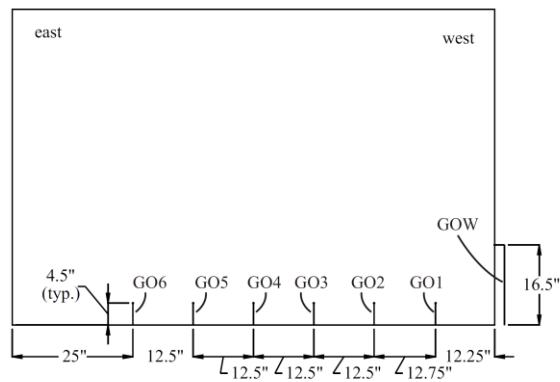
Gap opening instrumentation at base wall panel of specimen TW1 (from Perez et al. 2004)
